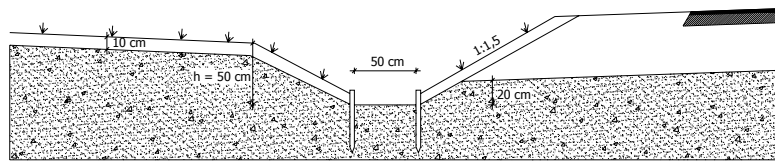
Protection of cross-section of trapezoidal ditch with wooden poles and longitudinal wooden wattle
